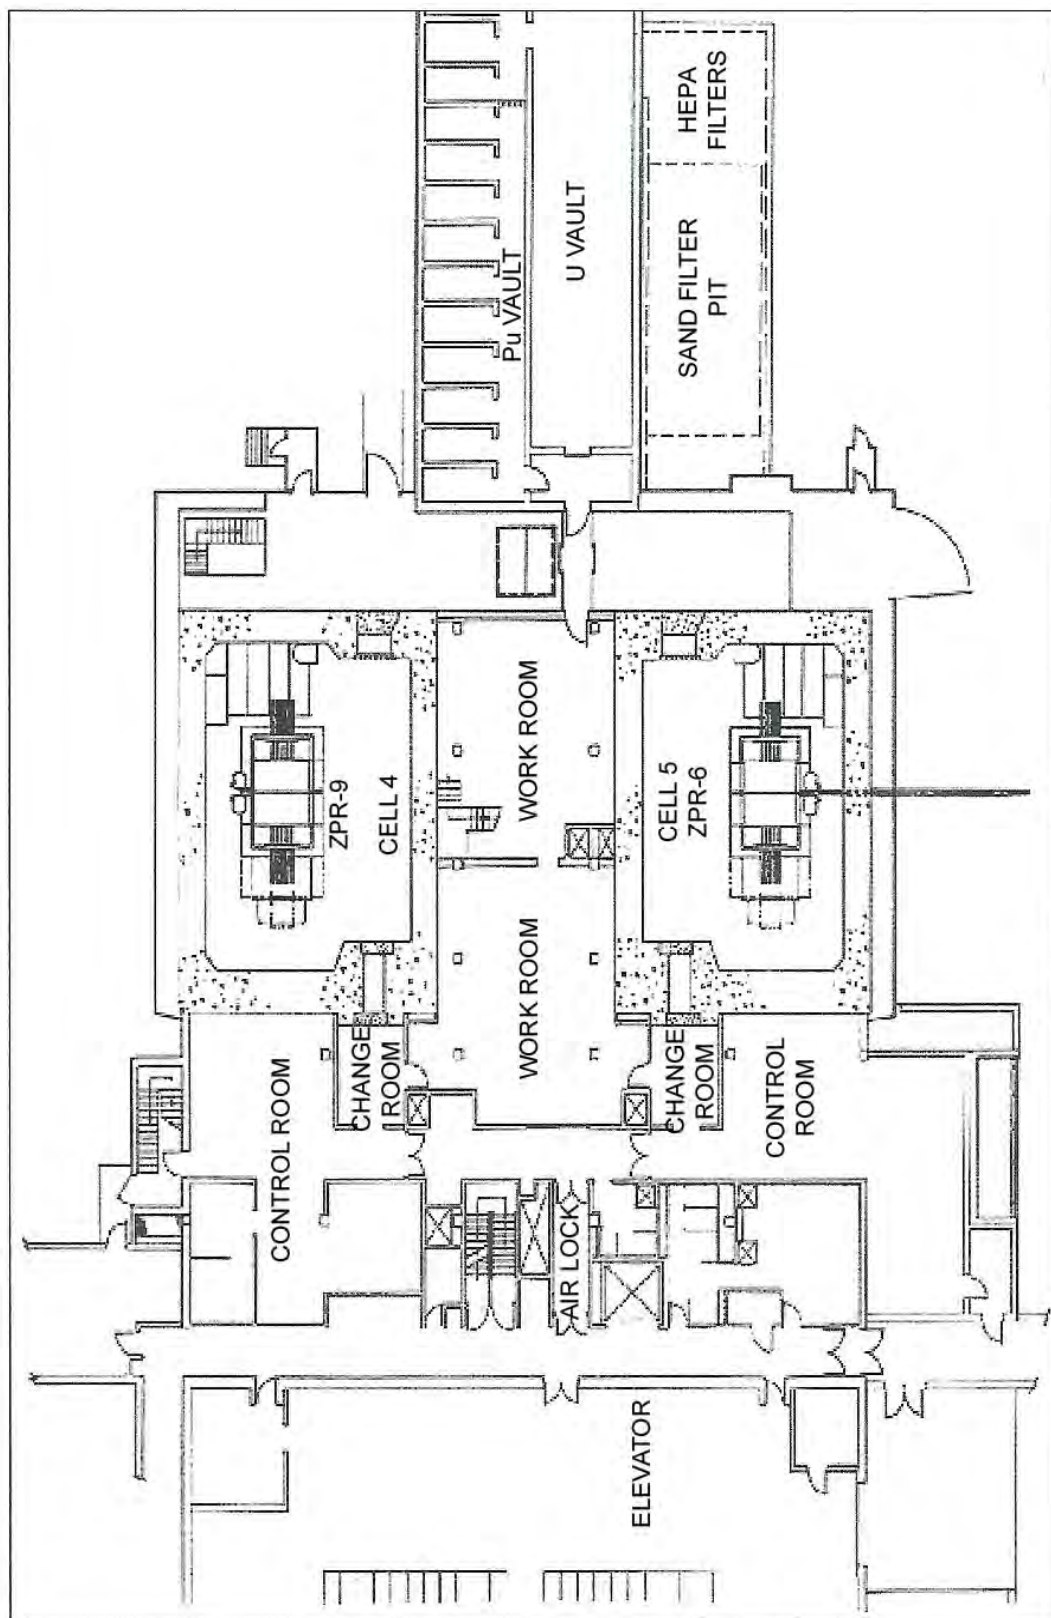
Diagram of ZPR-6 and ZPR-9 First Floor and Adjacent Rooms
